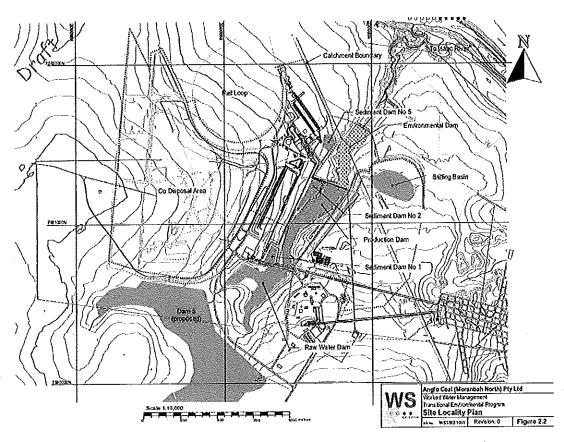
detailed layout plan of the Industrial Area showing the major water management infrastructure including proposed Dam 5
